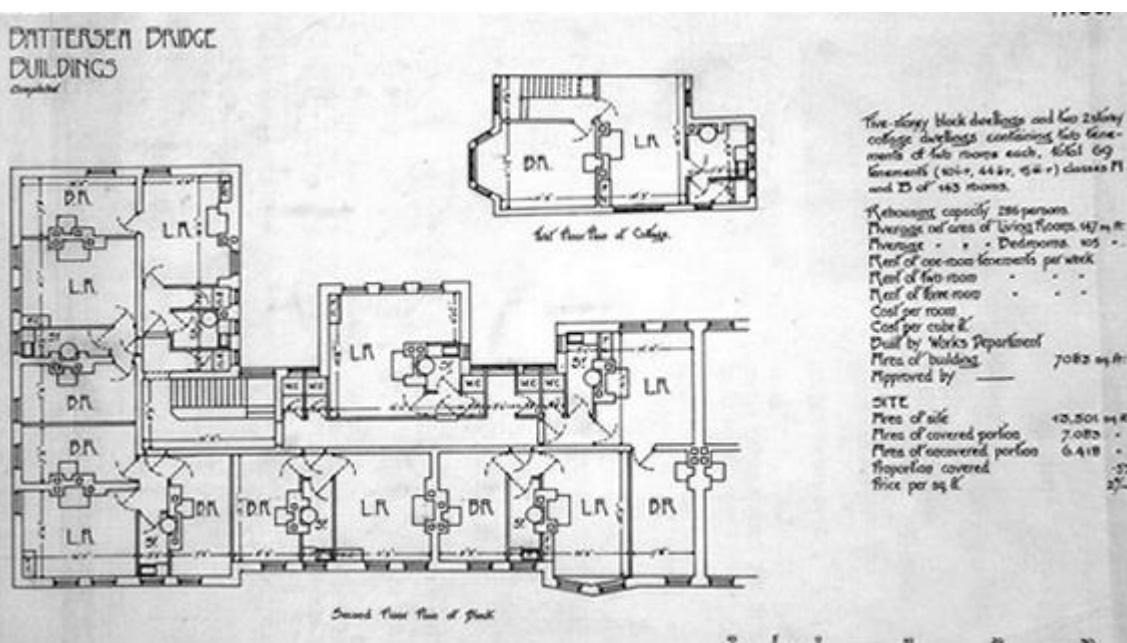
Battersea Bridge Buildings second floor plan (LMA ref: LCC/AR/HS/03/059)
